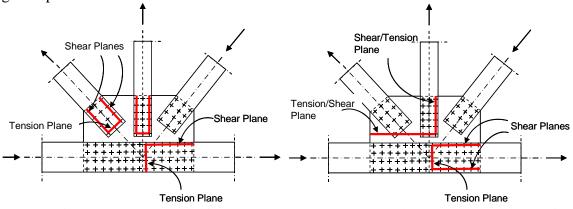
Examples of block shear rupture planes in gusset plates in tension
